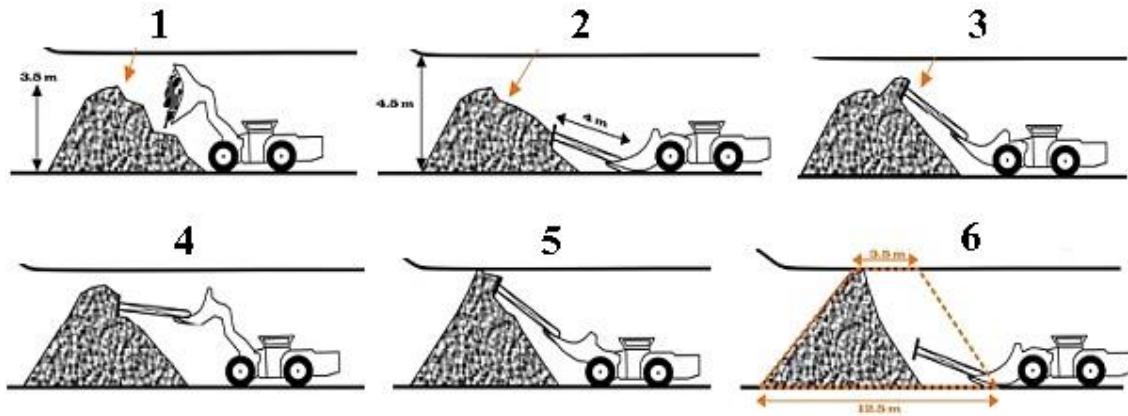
Construction stages of the waste rock barricade (from Gélinas, 2017).
